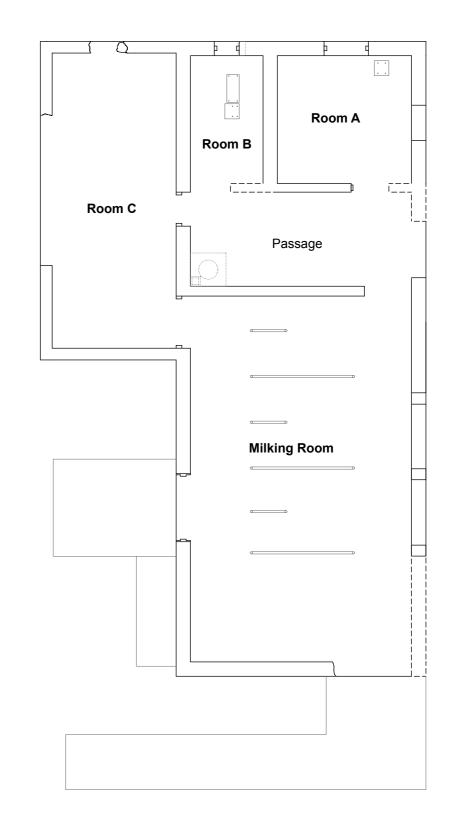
Site Plan, Chesterfield House Dairy (Palassis Architects, 2009)
